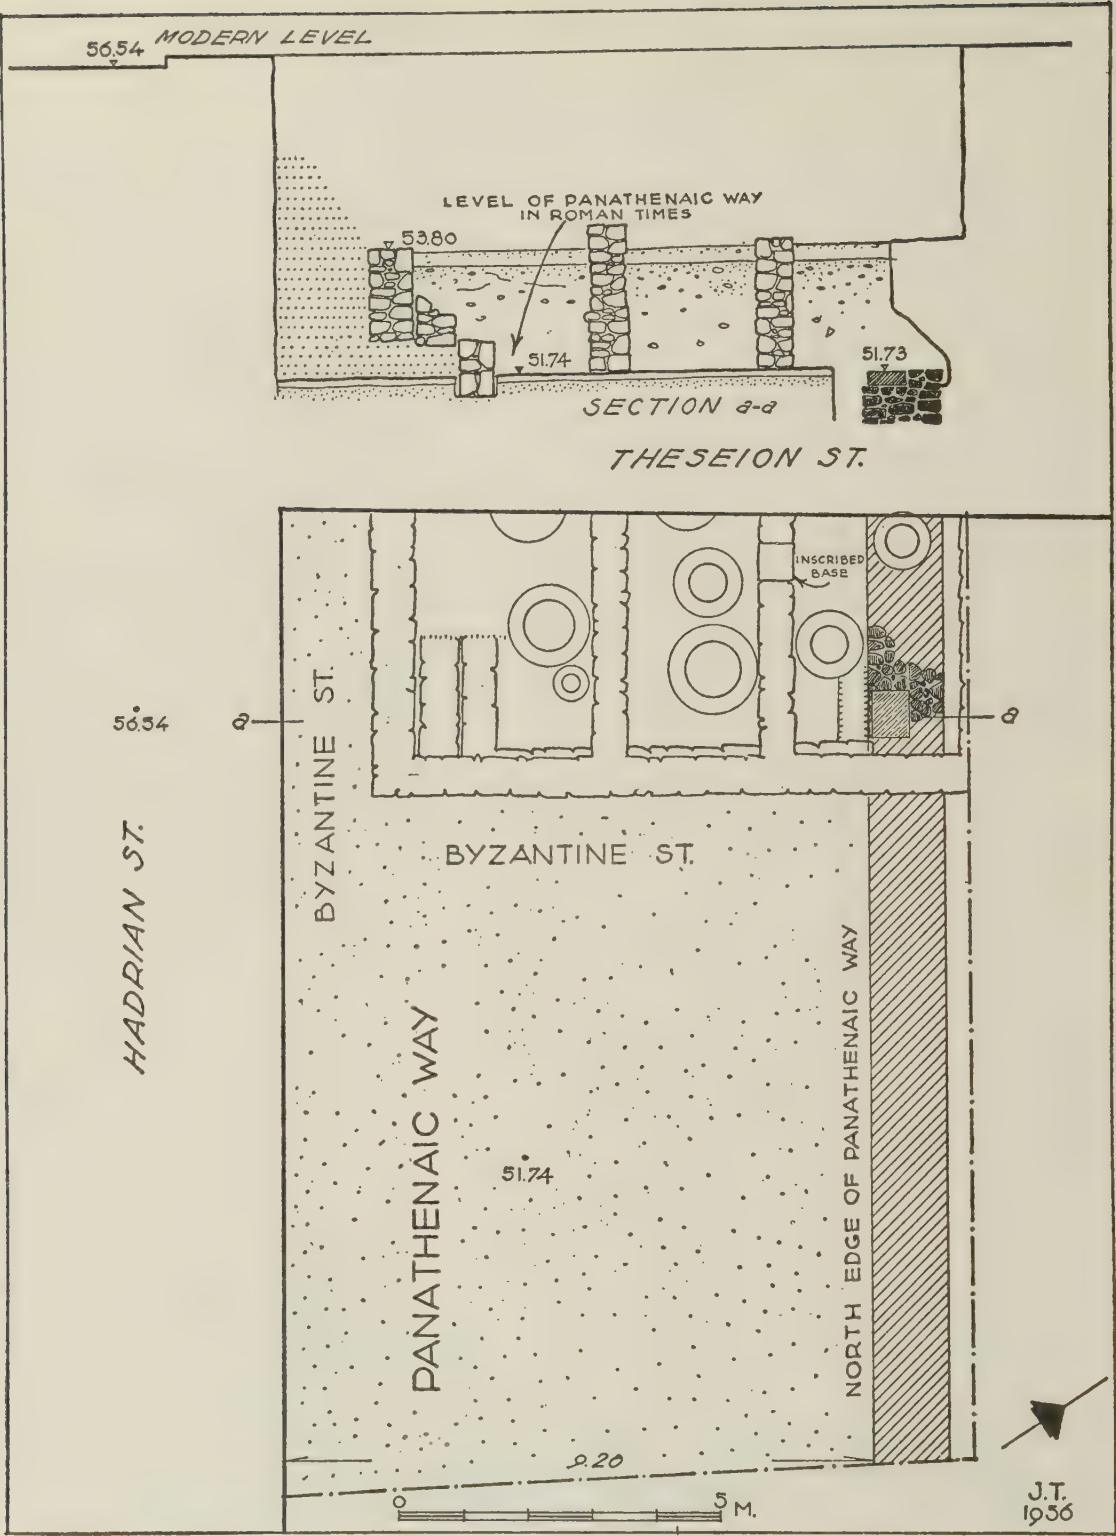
Plan and Section of the Excavation at No. 7 Hadrian Street.
